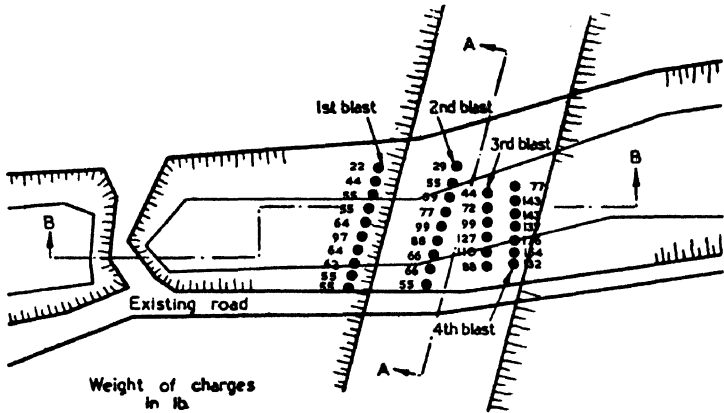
PLAN OF THE SITE AT SEEBURG SHOWING MAIN CHARGES
